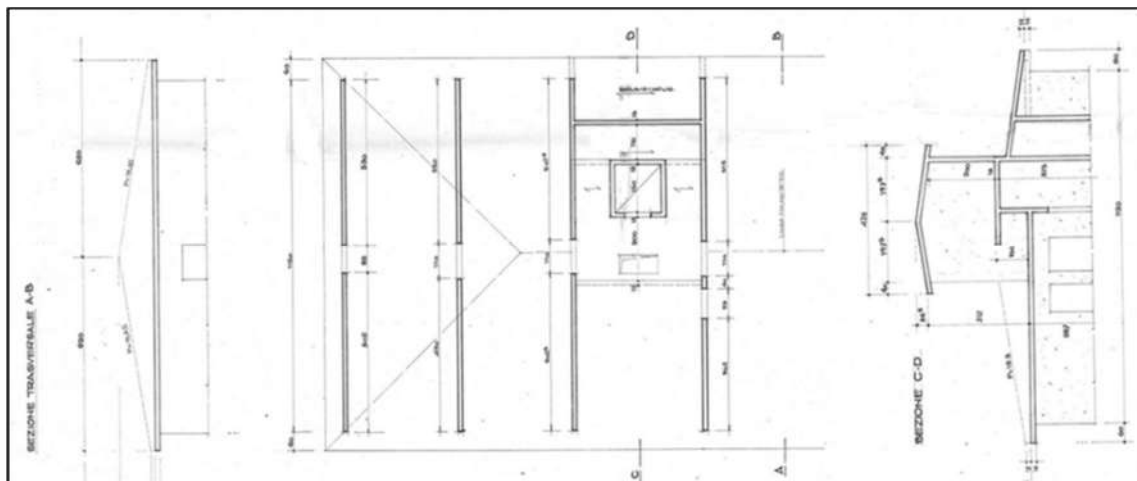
Structural Works on level 11.56m where the attic and roof slabs overhanging are highlighted regarding the building (F106.2T33).
